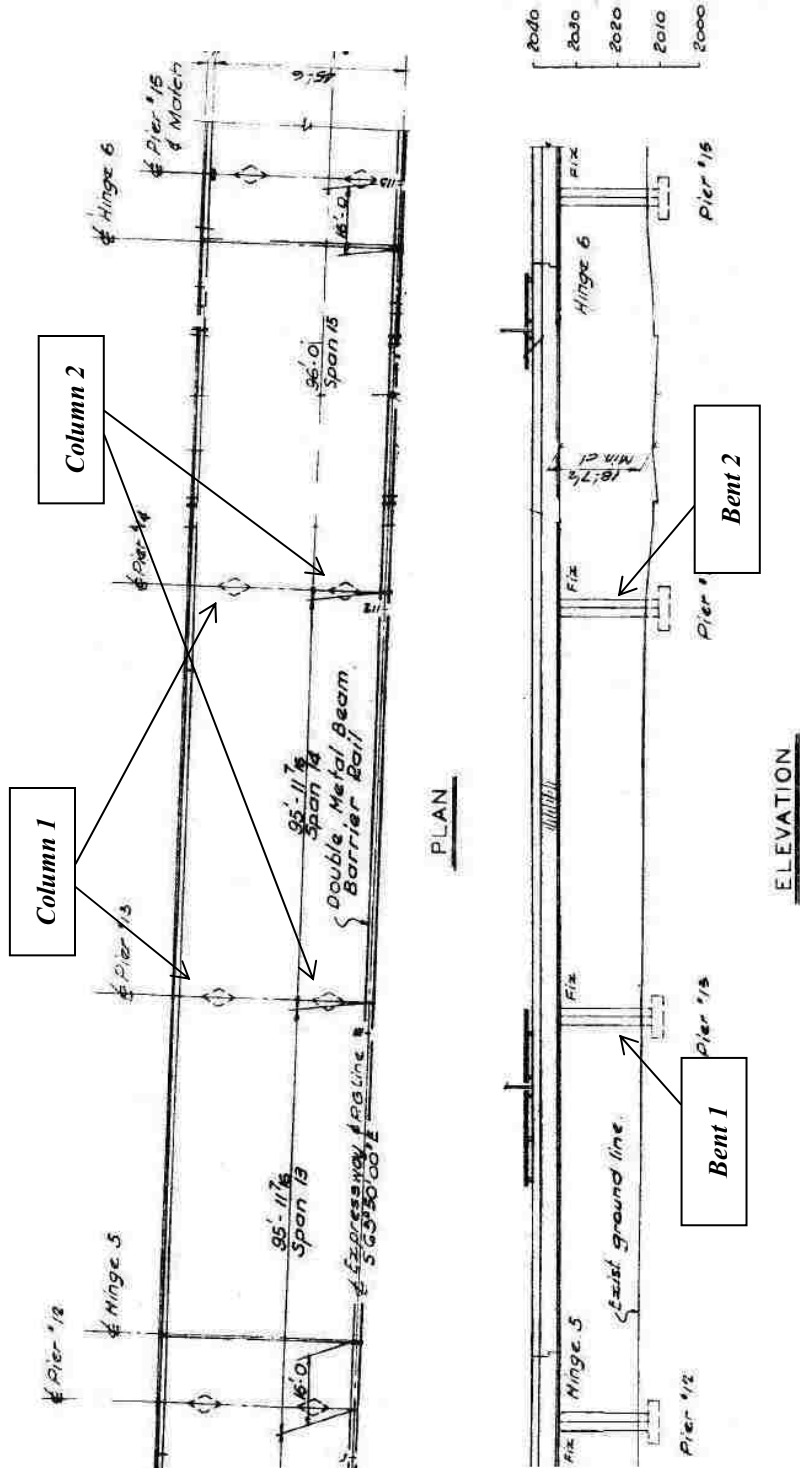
Bridge G-947 - Deck 6W, Plan and elevation
